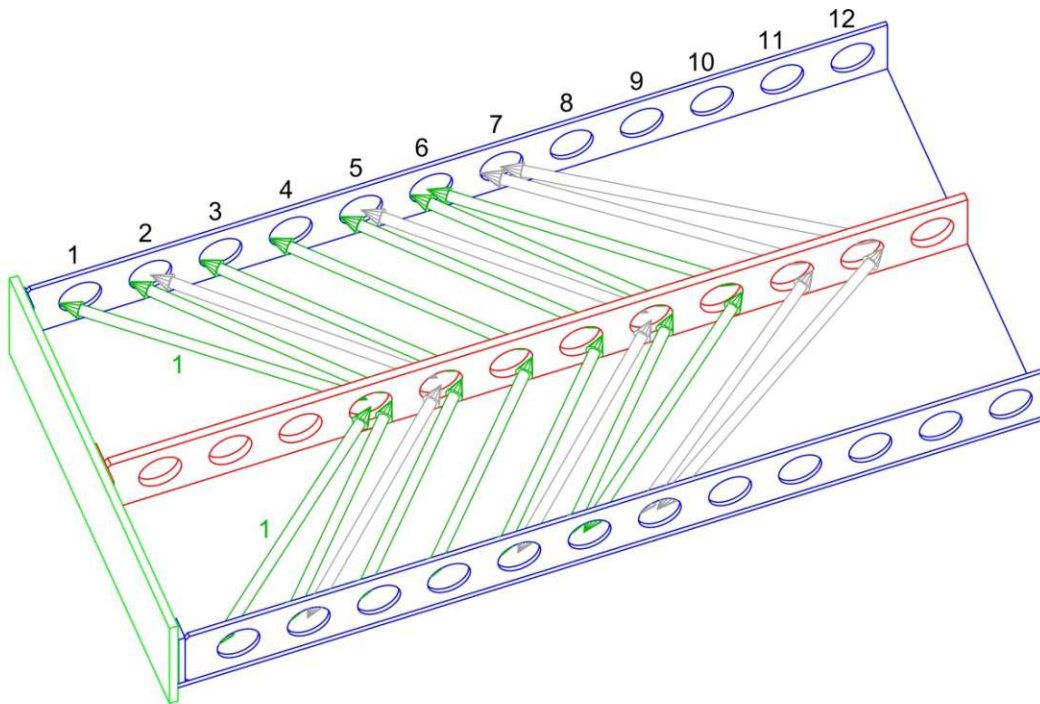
The green and grey concrete struts symbolise the horizontal force transfer between the steel sections. For simplification, struts with horizontal forces under 4,1 kN are not shown.
